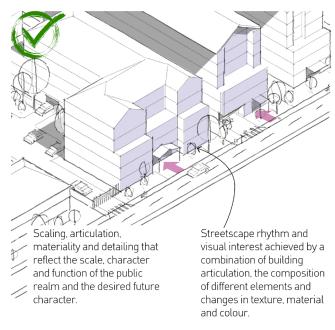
Multiple Dwellings - Facade Design Example Diagram
